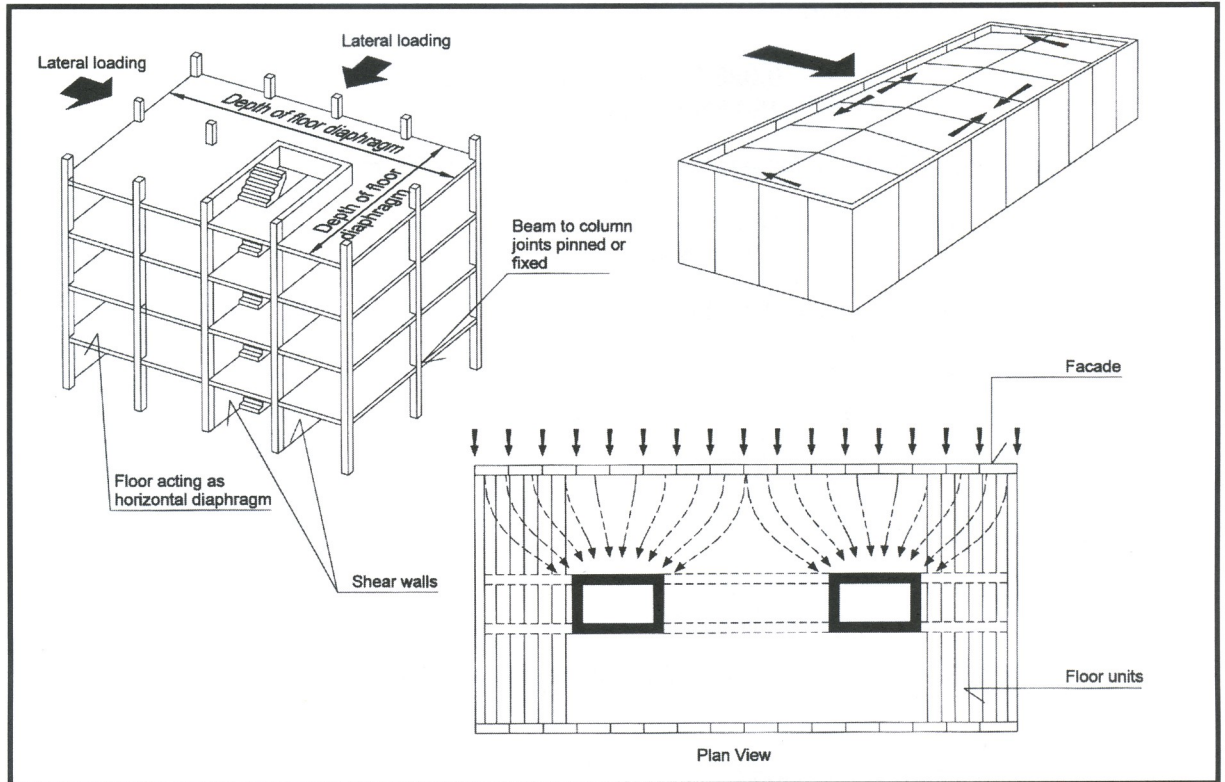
Diaphragm Action In Precast Floors And Roofs (reference 3)
